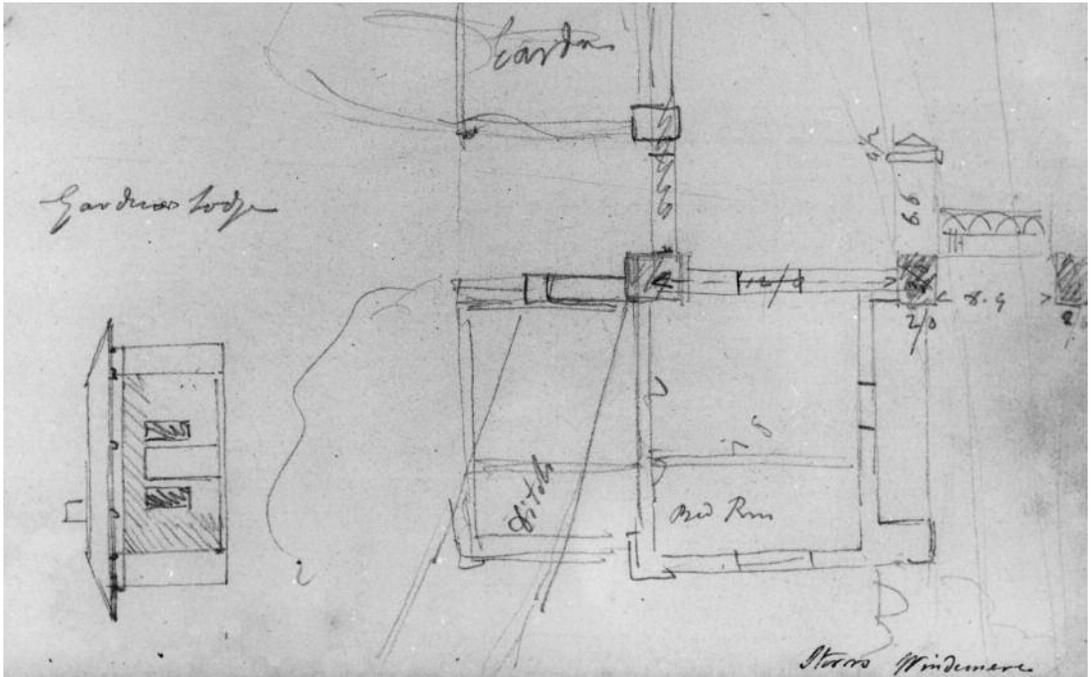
Sketch plan and elevation of Gardener's Lodge. Gandy Sketchbook, fol. 10r.
